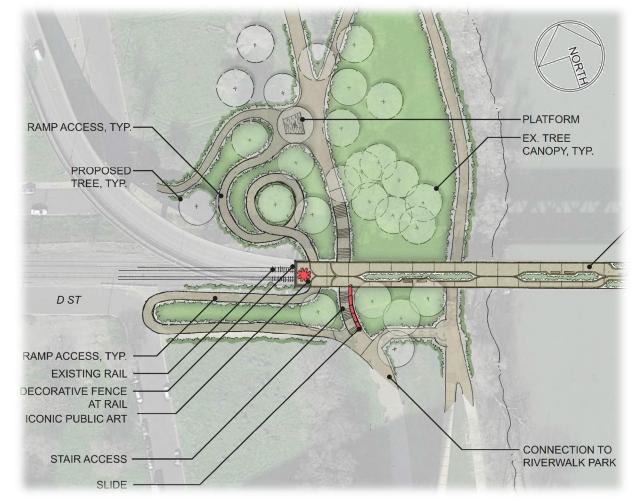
West Sacramento Approach Ramp Alignment Alternative 2
